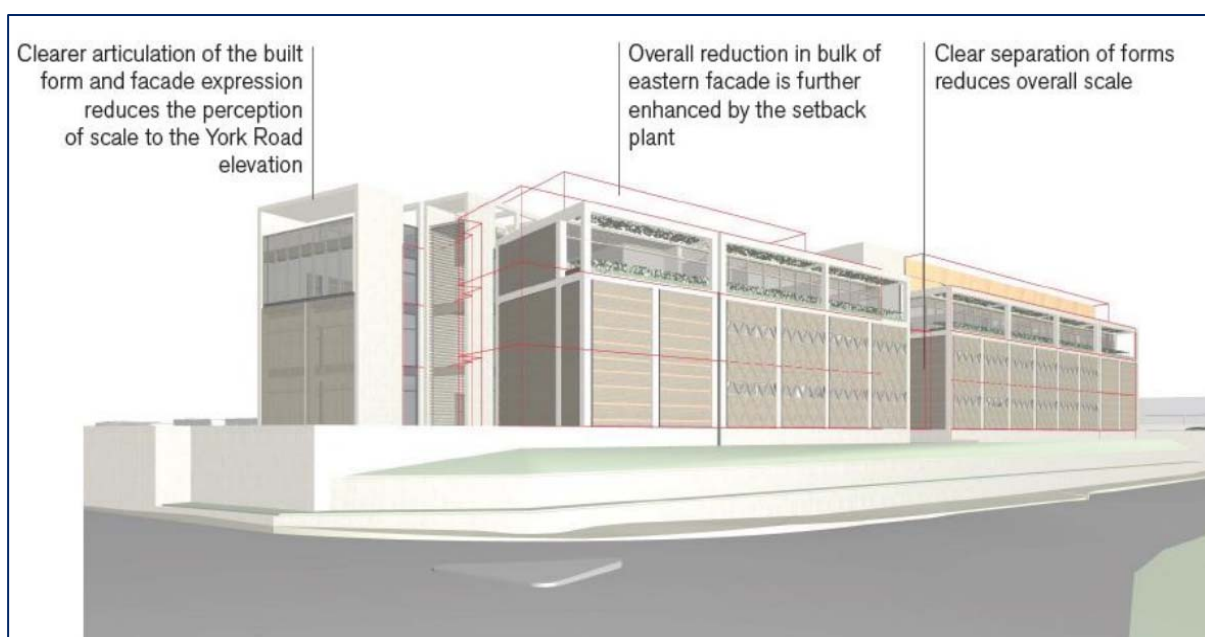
| Stage 1 building viewed from the junction of York Road and Baronga Avenue – design changes noted and red line indicates original EIS proposal (Source: Applicant's RtS)
